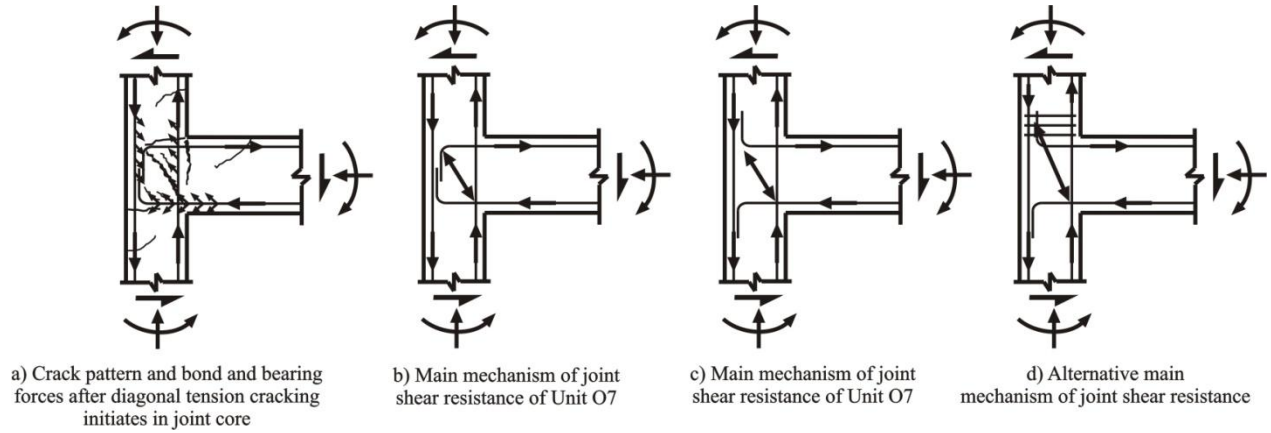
Main mechanisms of joint shear resistance of exterior beam-column joints with beam bars bent into the joint or outside the joint (modified after [21])
